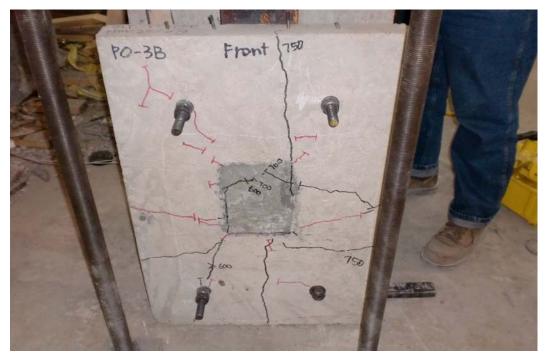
View of the crack pattern at failure on the front side of specimen PO-3B
